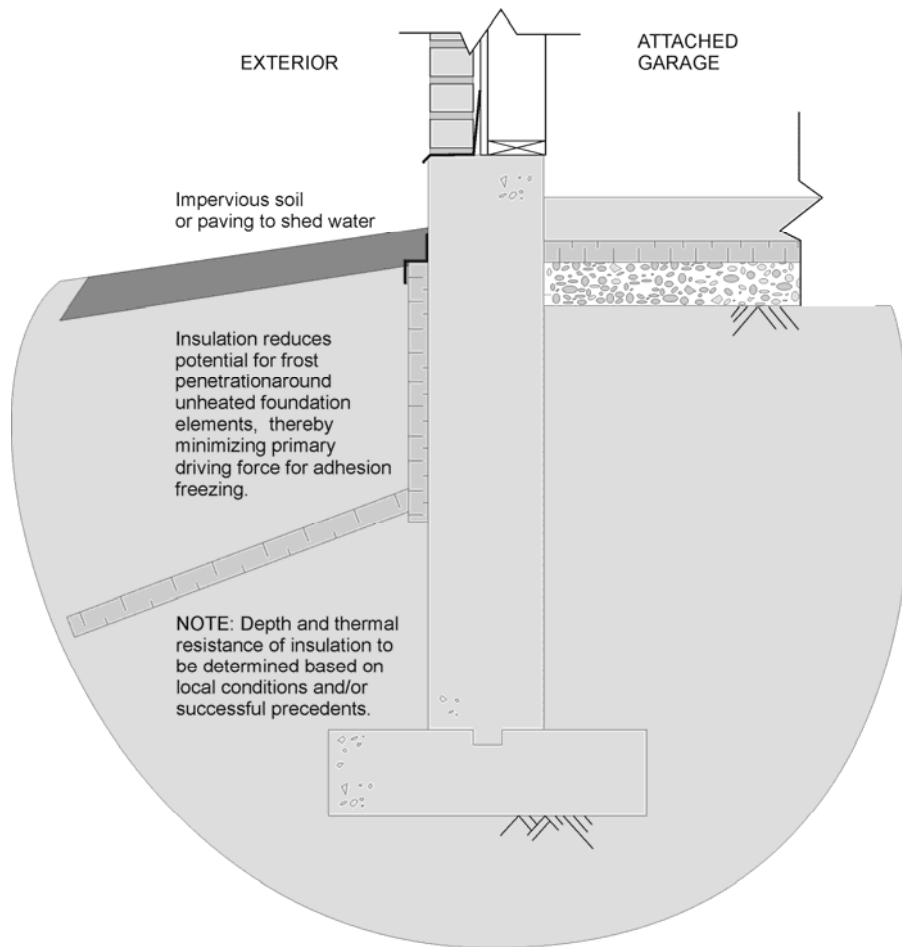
Modified approach to adfreezing protection of unheated, attached structures.
